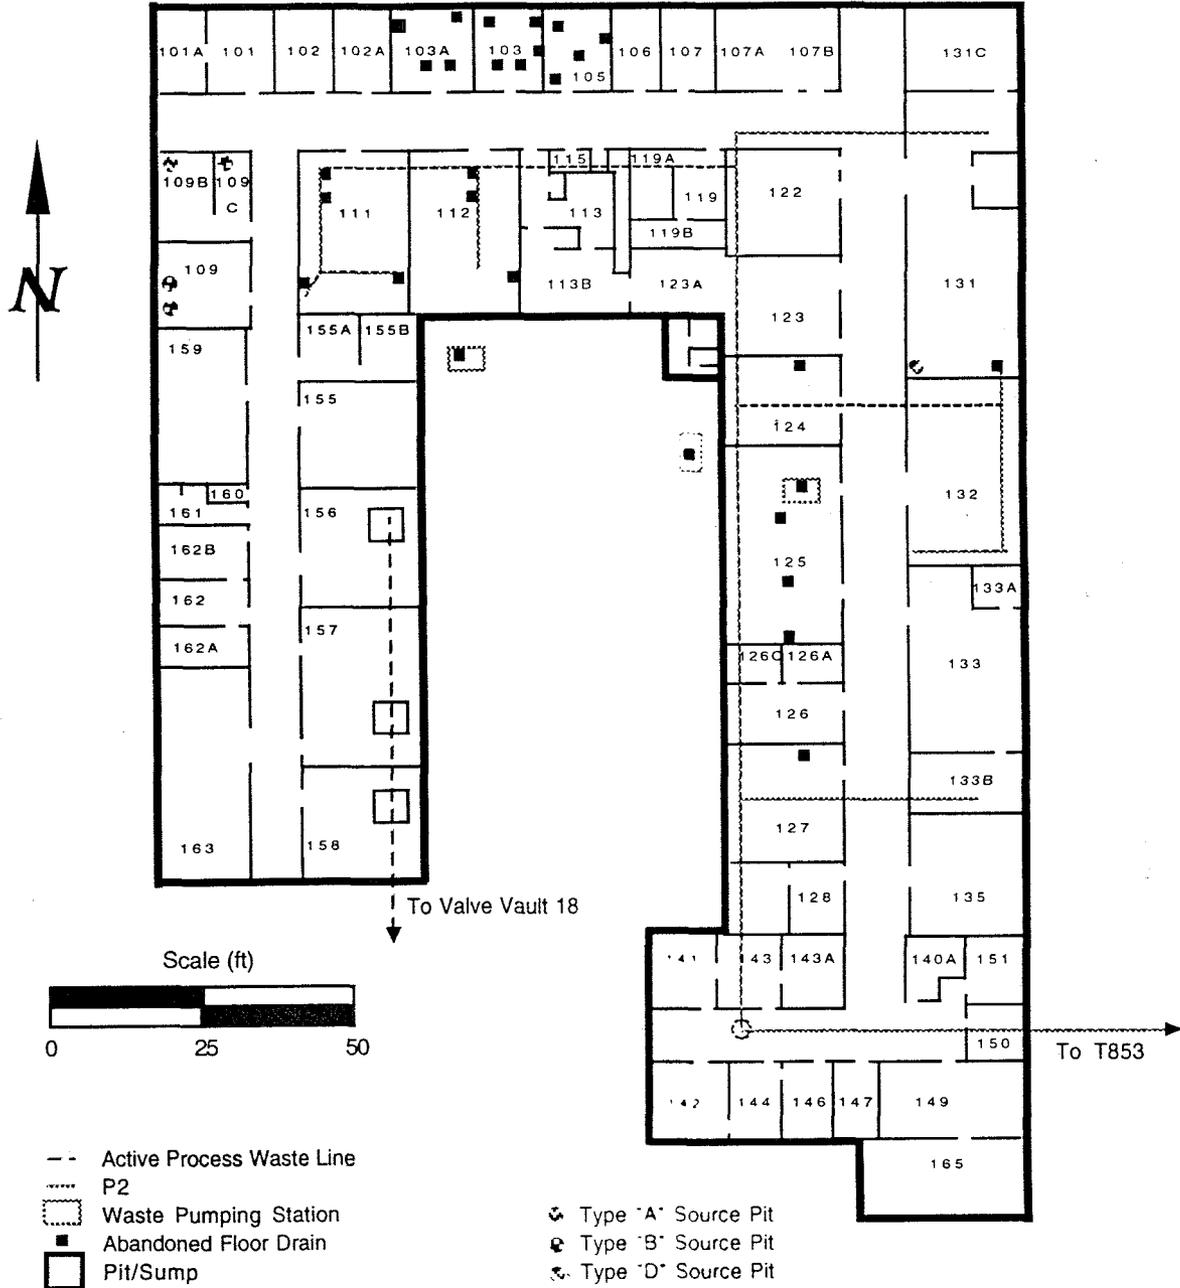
Locations of Abandoned Floor Drains and Pits in Building 123
